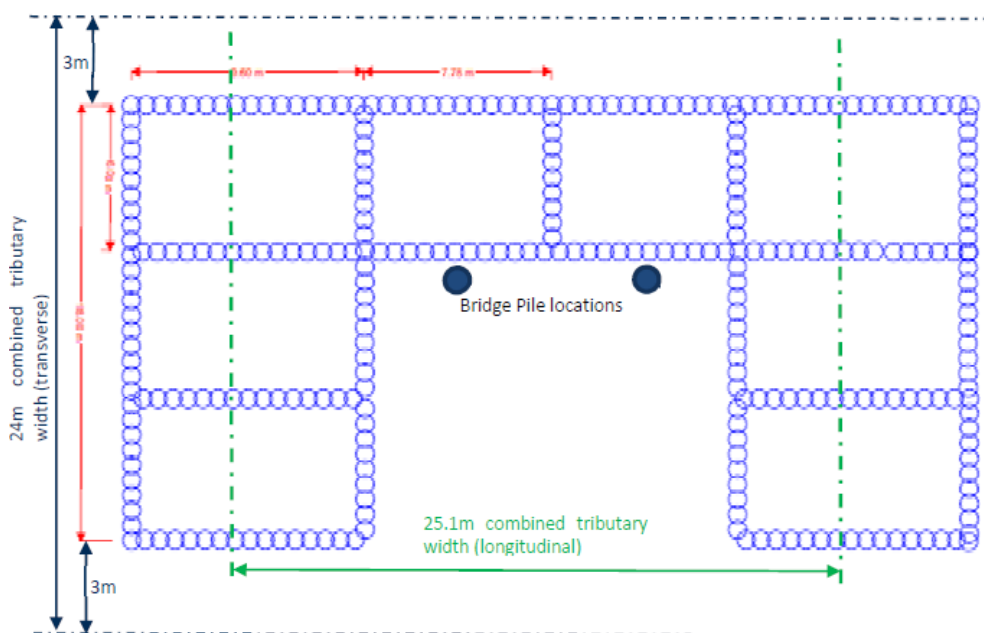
Plan of CFA cellular grid arrangement installed in front and to the sides of the bridge abutment piles, where the approach embankment ground slopes away from the centre. Diagrammatic/ not to scale.
